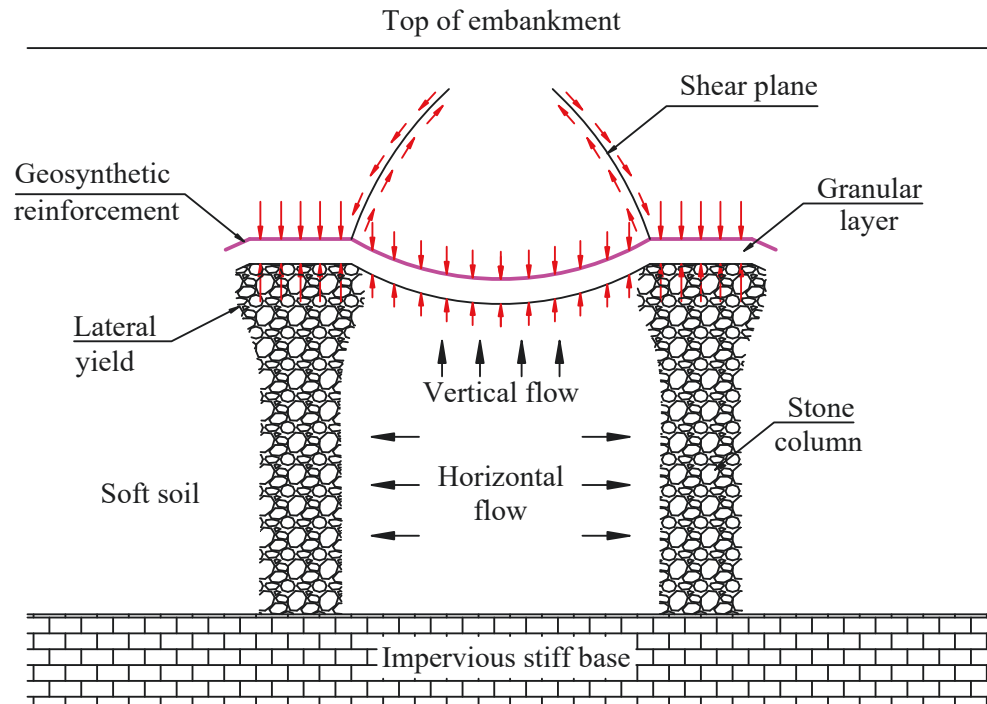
Deformation of a typical embankment fill – soft soil foundation system stabilised by stone columns (after Deb [184] and Basack et al. [185])
